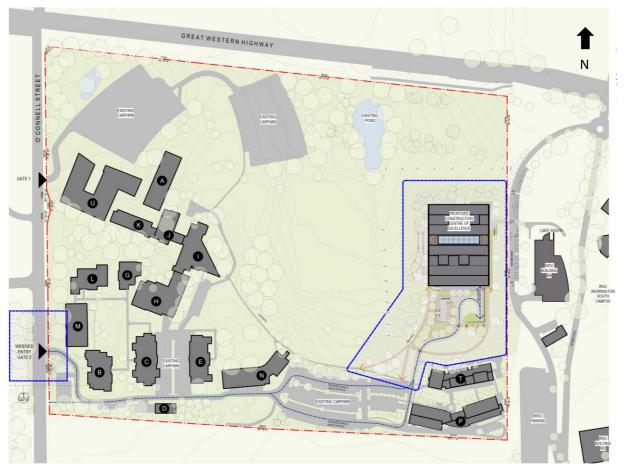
TAFE NSW IATC Proposed Site Plan (Source: Gray Puksand)
